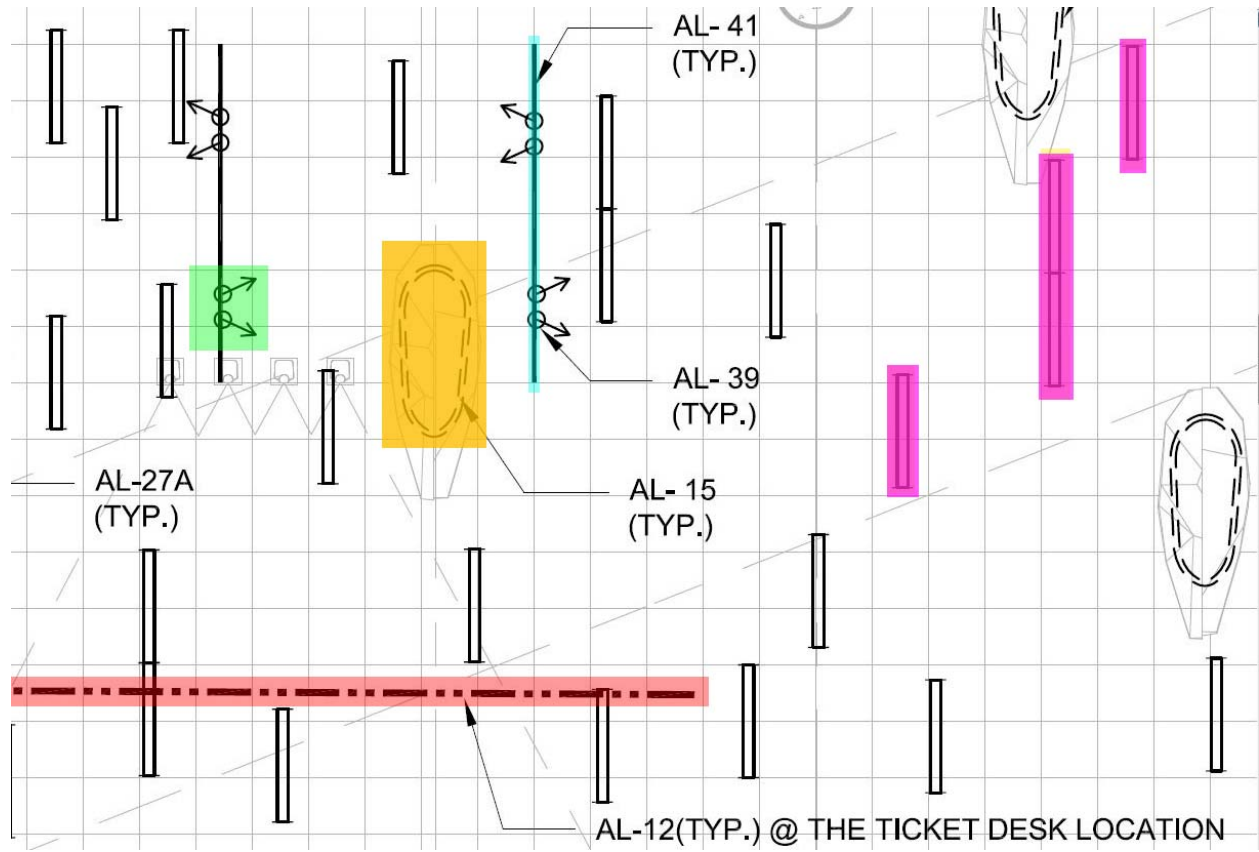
, Ground Level Lighting Plan Call Out – Exhibition Area
